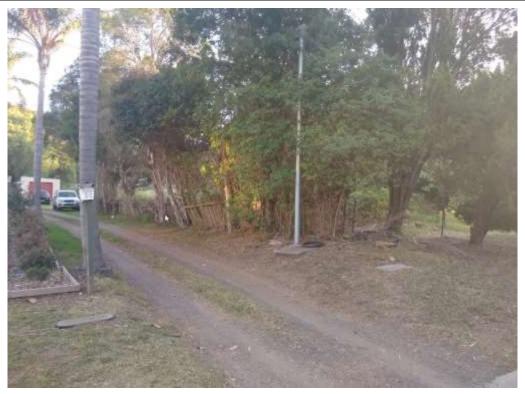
Site photograph (view of the existing entry to 14 Bland Street)
